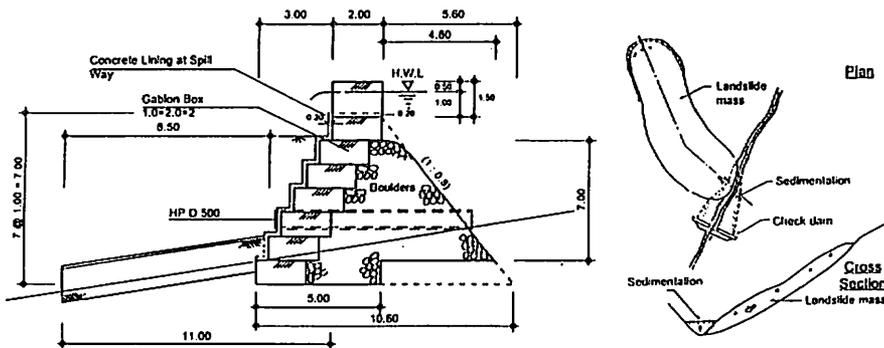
Consolidation dam applied to act as toe loading at the foot of landslide block.
